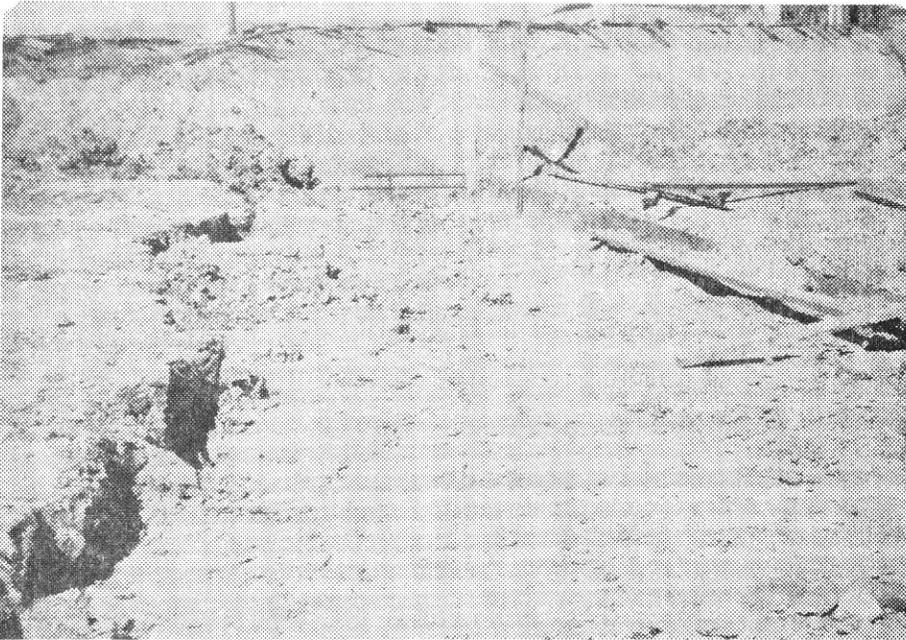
Abutment backfill settlement at the Via Princessa Undercrossing. Note large crack which delineates limit of backfill.
